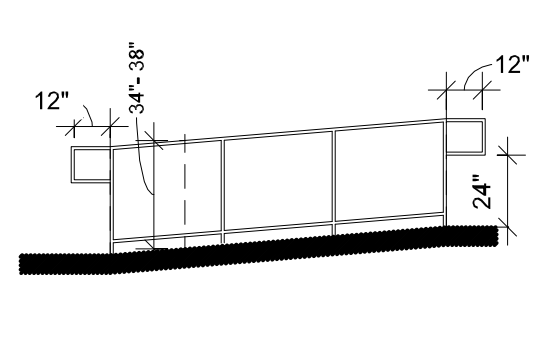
TOP AND BOTTOM HANDRAIL EXTENSIONS AT RAMP
